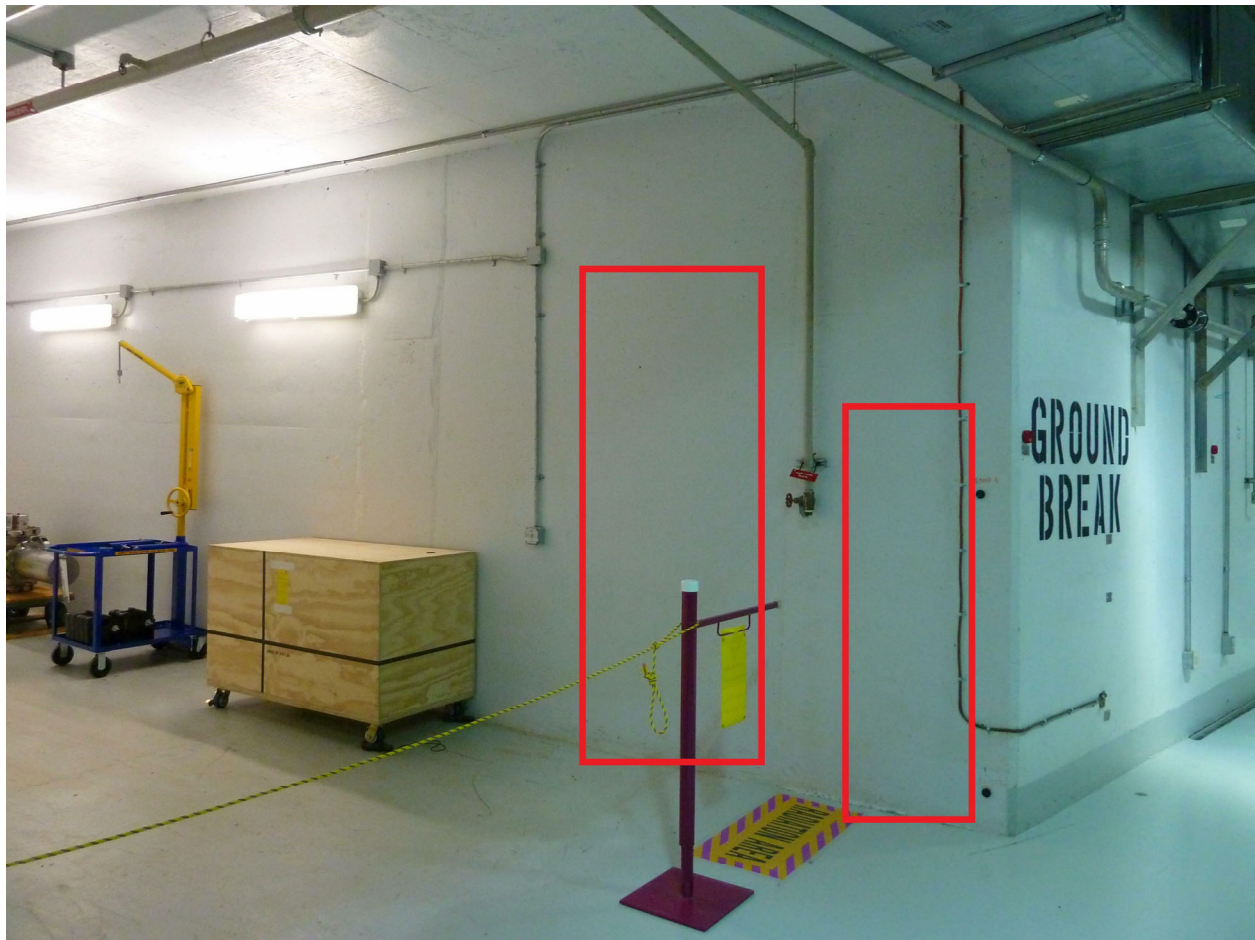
Approximate location of designed tunnel wall penetrations from RTBT to RTBT stub.
